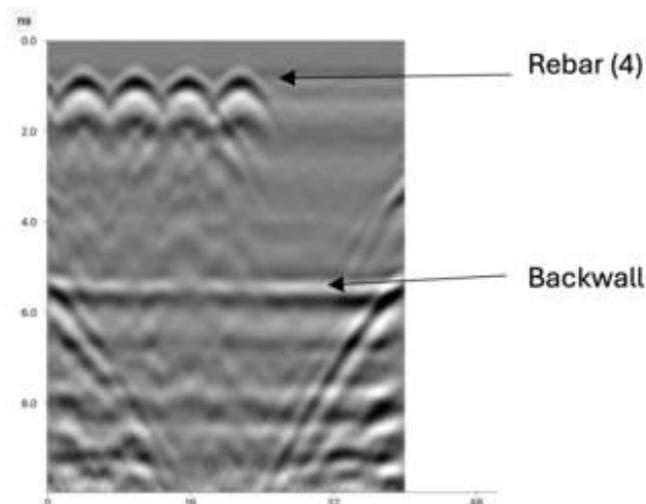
Typical GPR image, called radargram, with rebar and backwall
